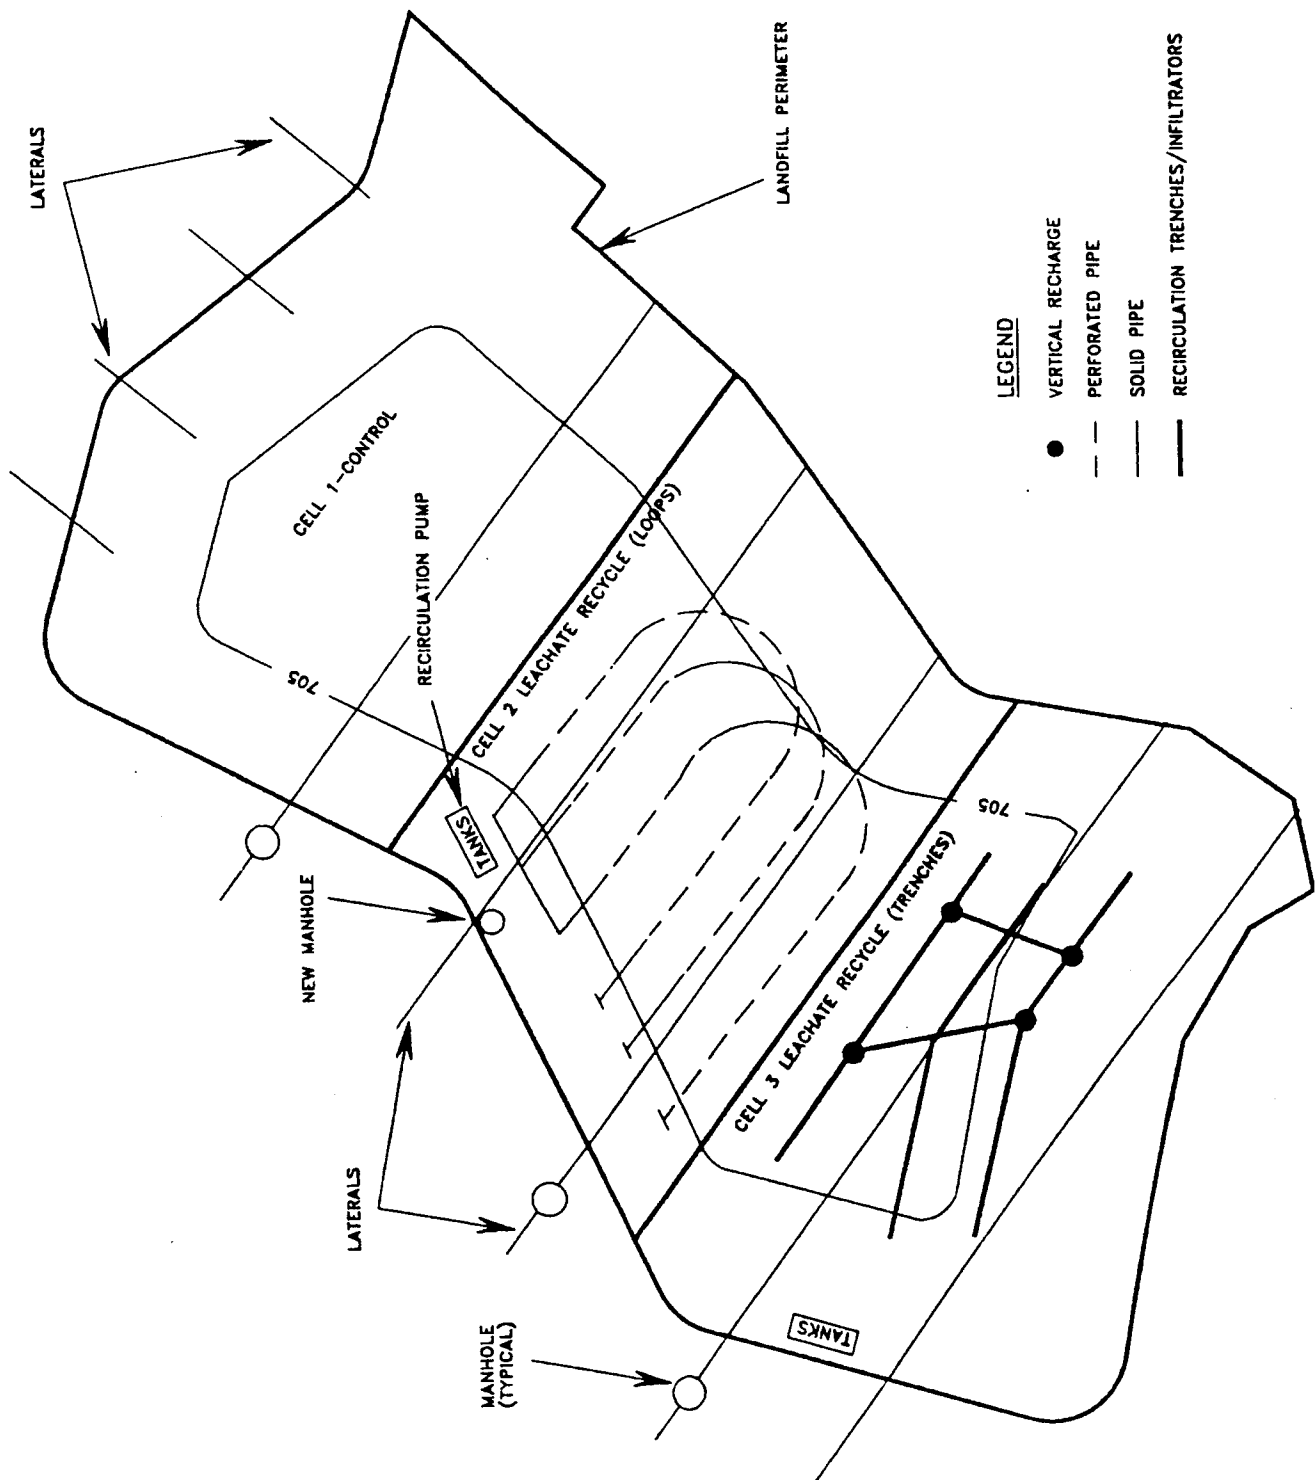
Mills Seat Landfill (Rochester, NY) recirculation layout (elevation 215 m).
